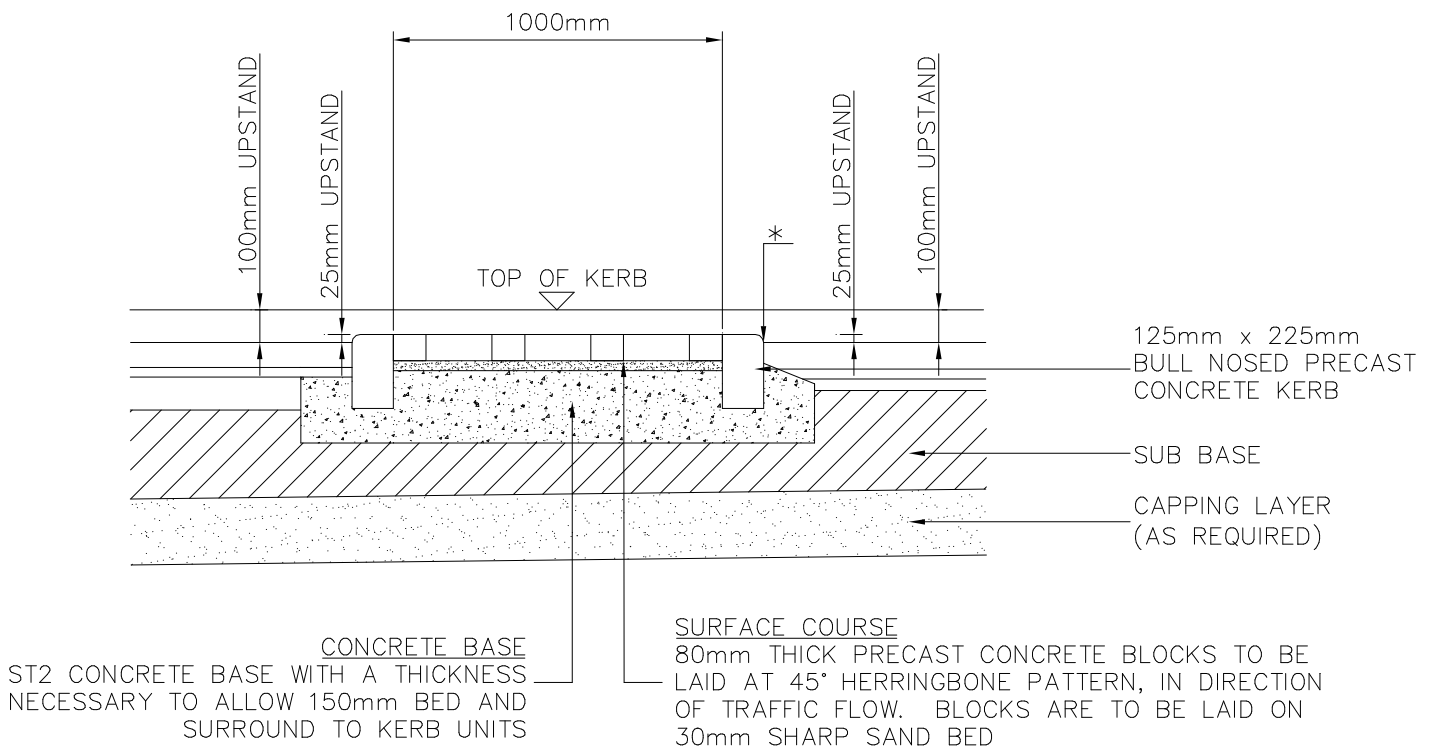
(DETAIL MAY ALSO BE USED TO FORM TRANSITION FROM BITUMINOUS TO BLOCK PAVED ROAD CONSTRUCTION)
